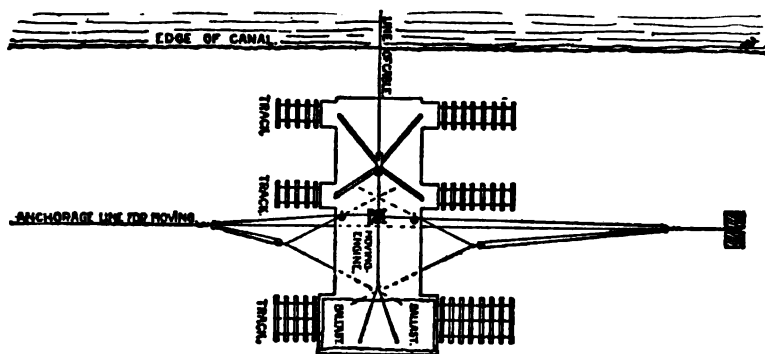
Showing Details of Cableway as used by the Chicago Drainage Canal.
